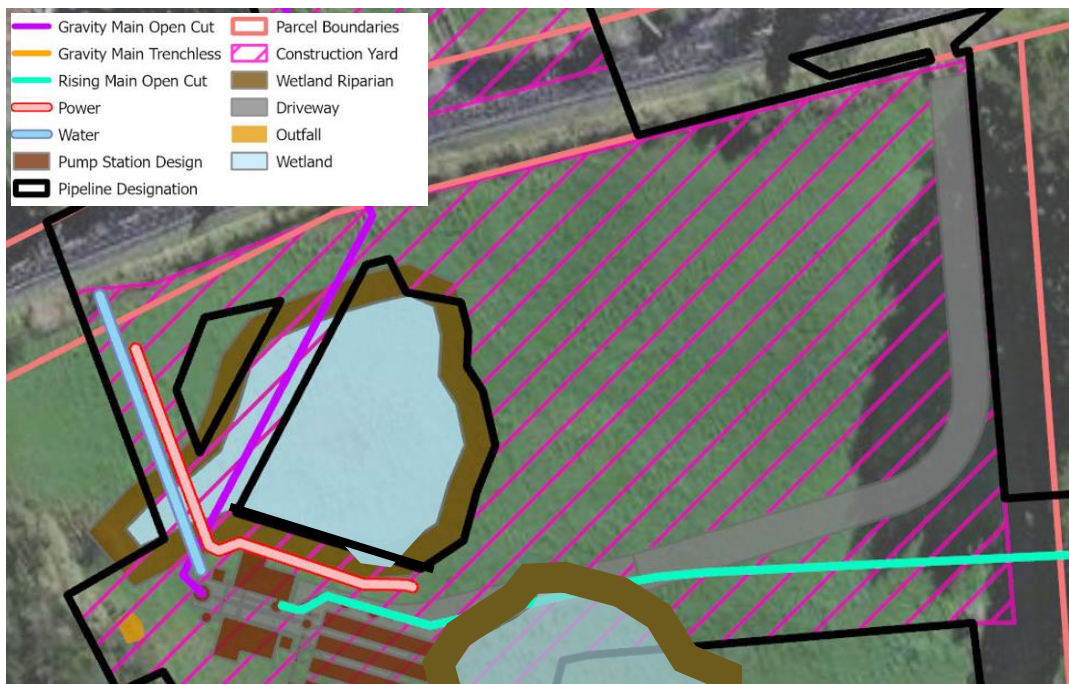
Permanent and temporary access to the pump station (shown in grey)
